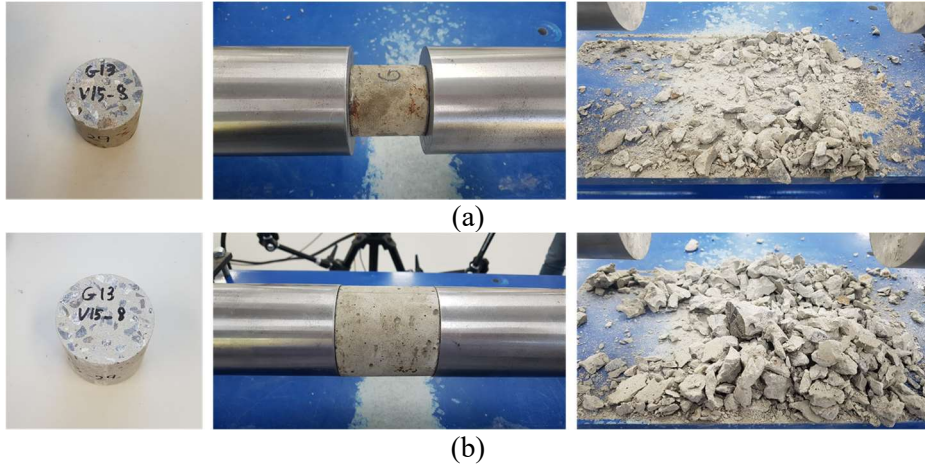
Test specimens for each dimension; (a) D50×L50; (b) D75×L75
